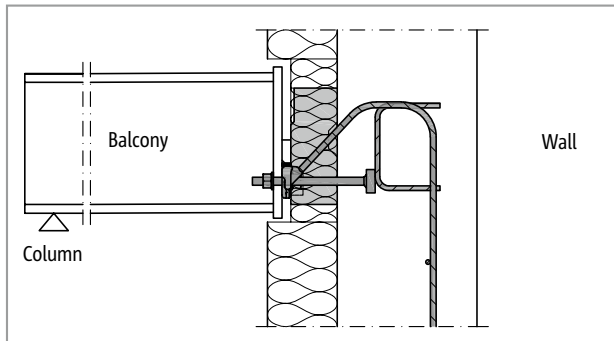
Schöck Isokorb® T type SQ-WU: Special construction; required with connection to a reinforced concrete wall with a wall thickness from 200 mm
